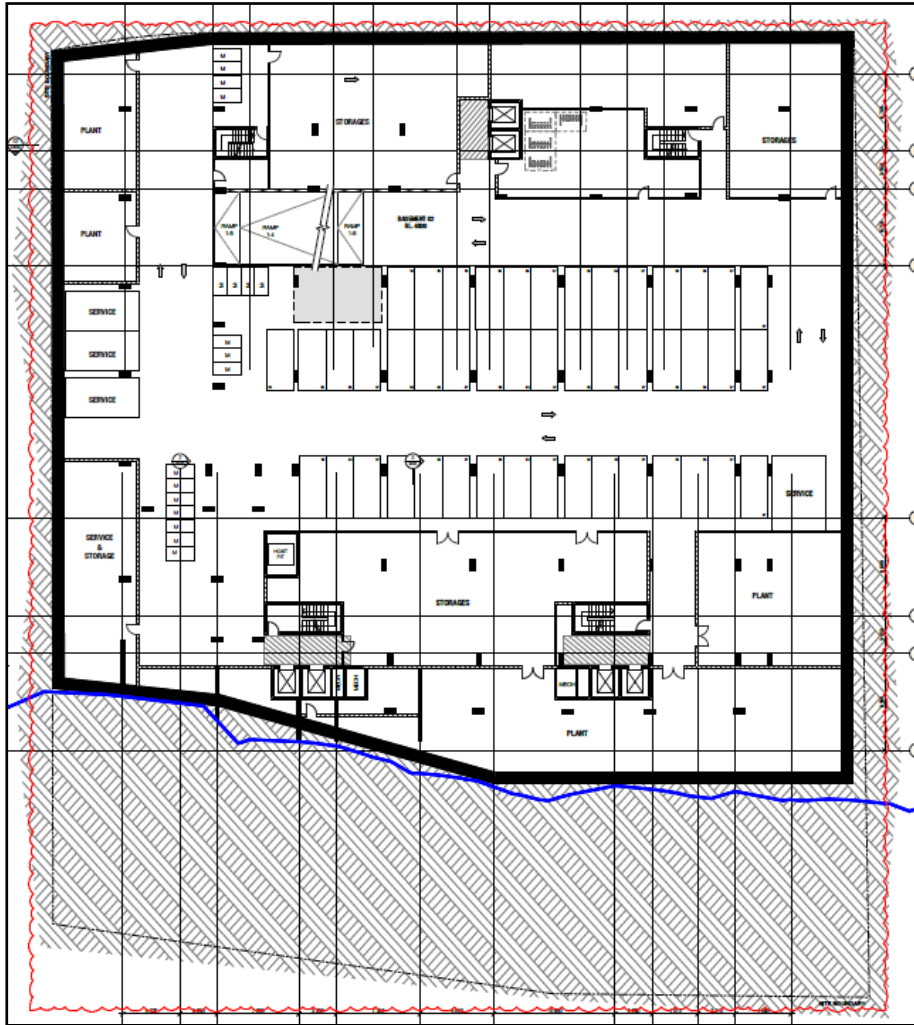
Amended basement level to address foreshore building line (source Woods Bagot)
